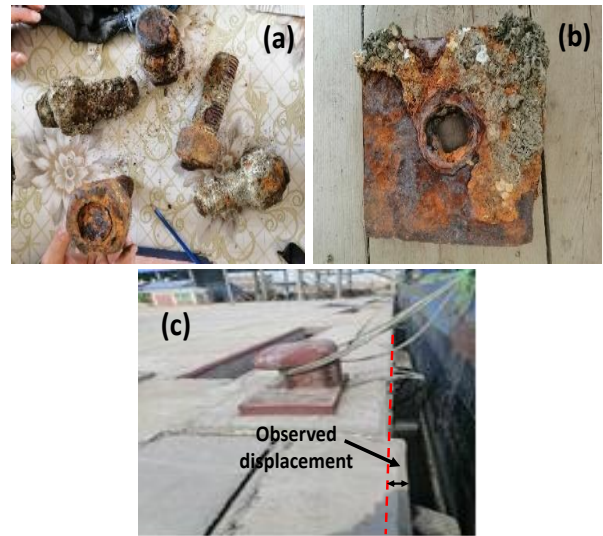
Sheet pile wall inspection photos: (a) anchor deterioration, (b) Plate failure, and (c) Lateral displacement at the top of the quay wall head.
